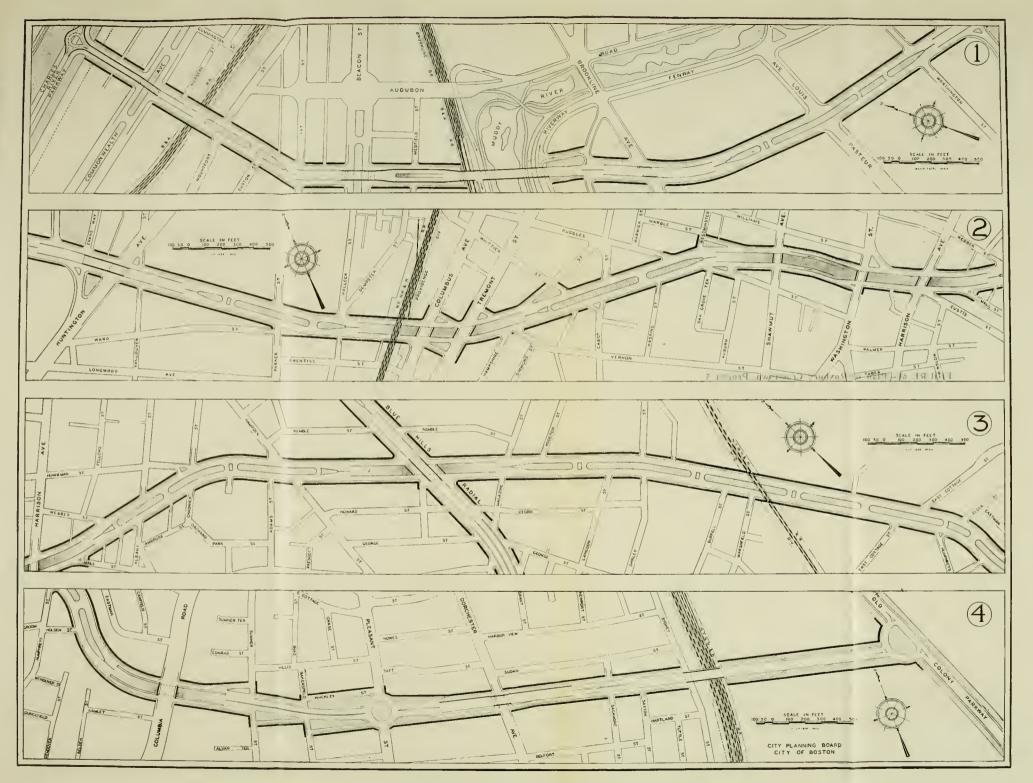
PLAN OF ROXBURY CROSSTOWN, PROJECT 5.
